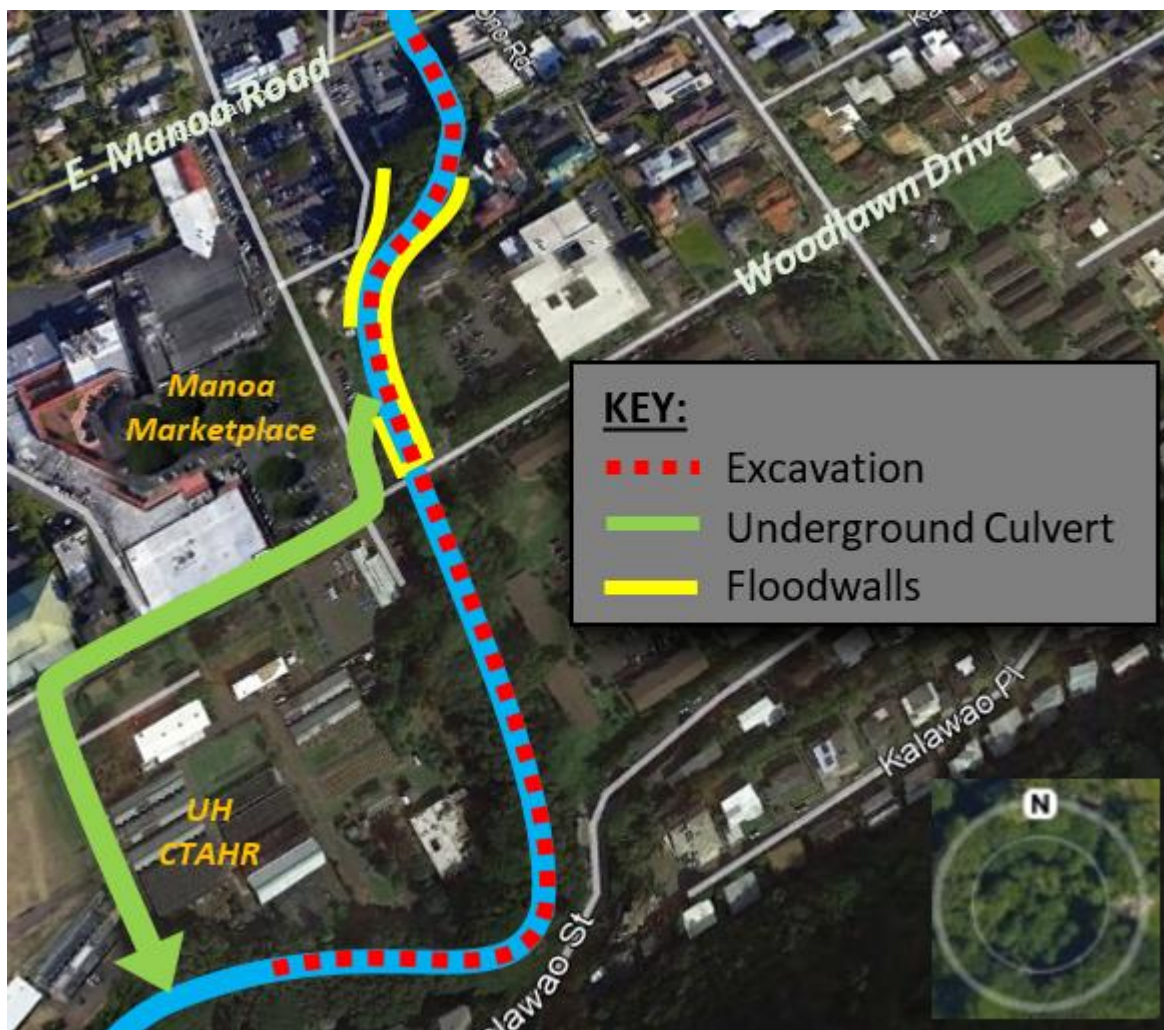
Bypass Culvert Installation at Woodlawn Bridge, Manoa Stream
